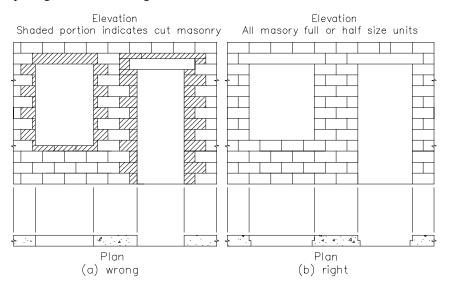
Examples of wrong and right planning of masonry wall openings.
